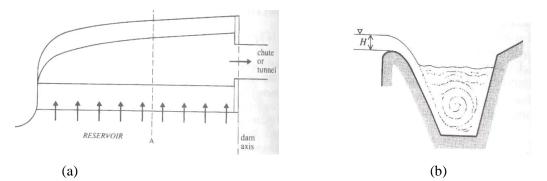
Side channel spillway: (a)Plan (b) section A-A, side view
